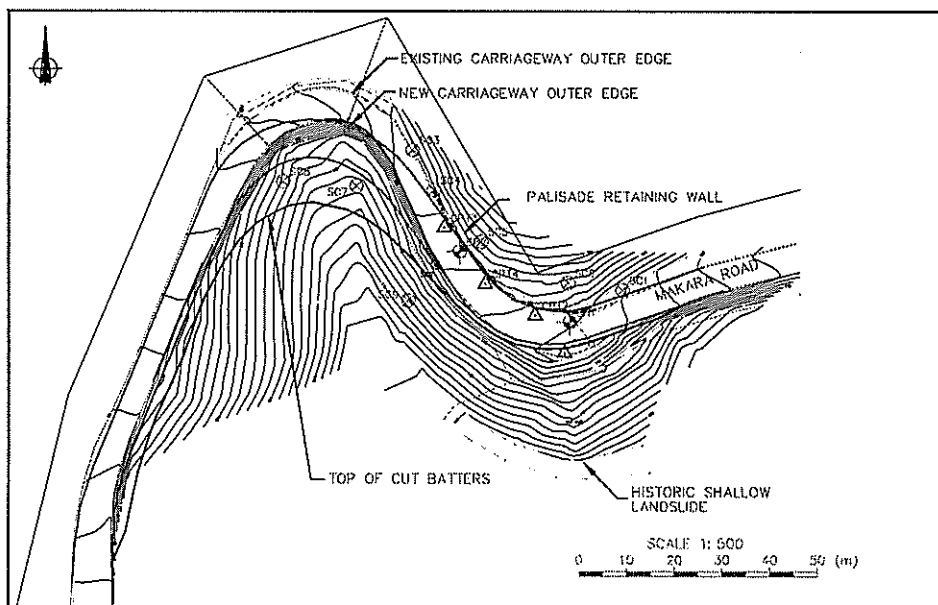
Existing contour plan with investigation test locations and the proposed carriageway alignment.
